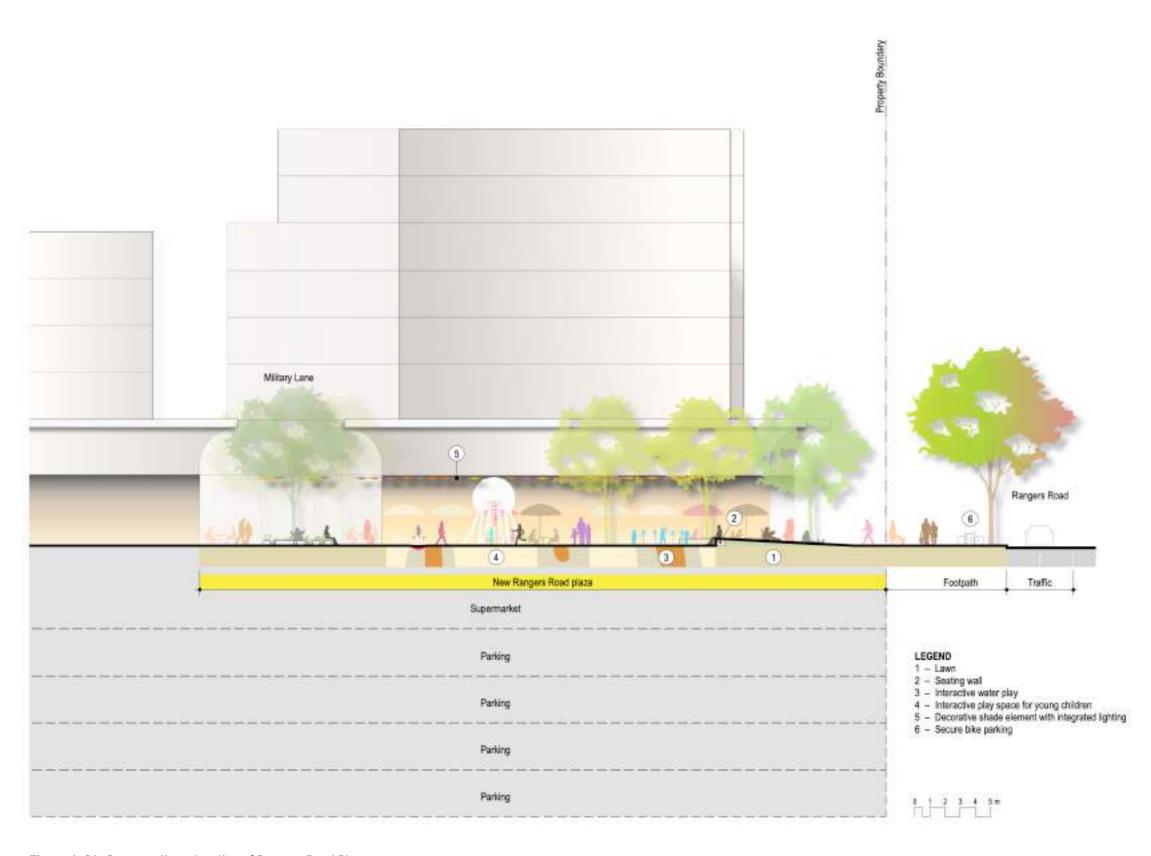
Cross section-elevation of Rangers Road Plaza
